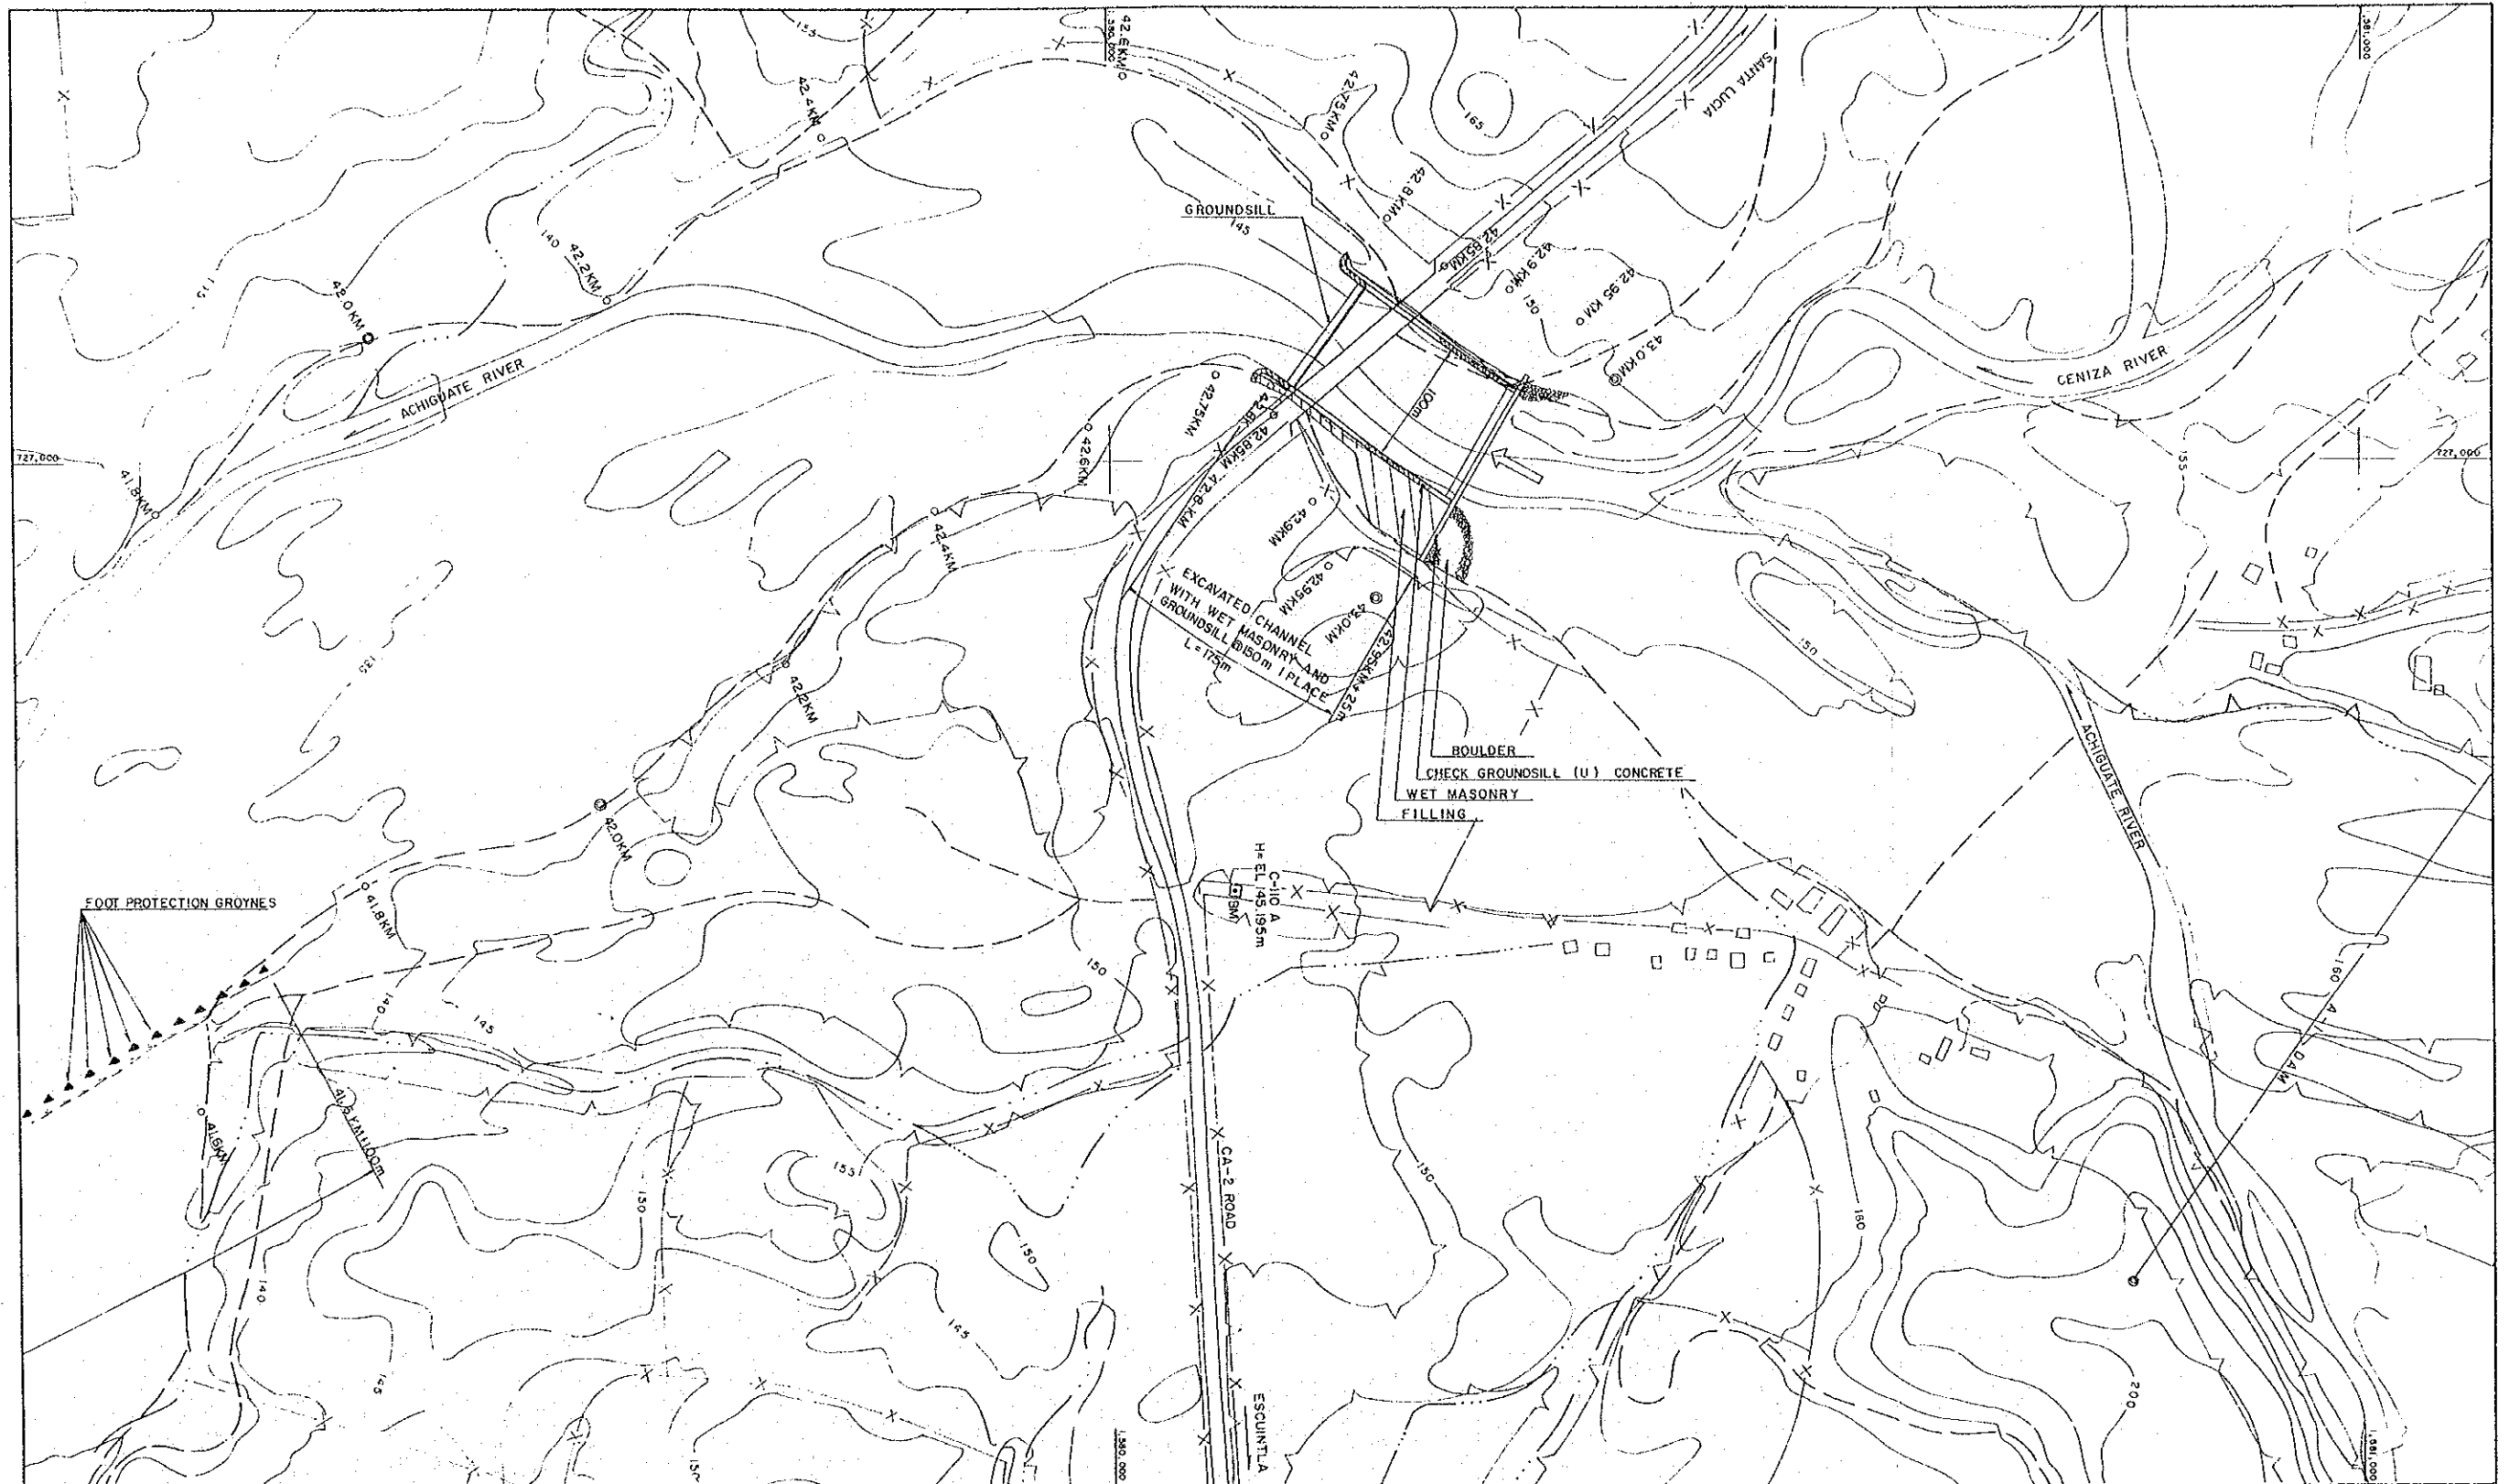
(2/6) PLAN OF RIVER IMPROVEMENT IN THE PROPOSED URGENT PLAN (ACHIGUATE RIVER)
